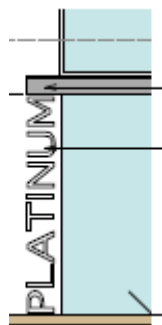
Signage to be located at main entrance below awning structure and to be illuminated by downlights.
